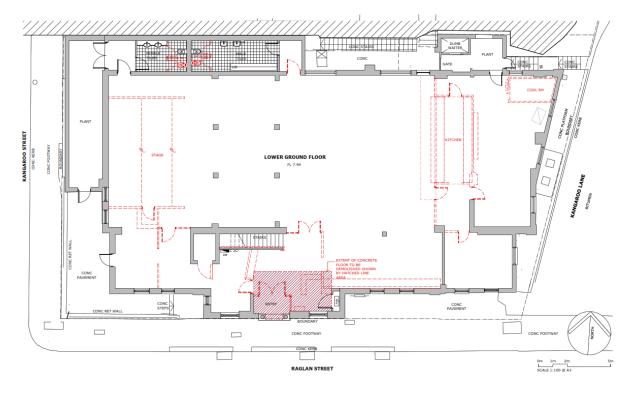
Raglan Street Lower Ground Floor Demolition Plan (Building Assets Planning Design and Delivery Northern Beaches Council).
